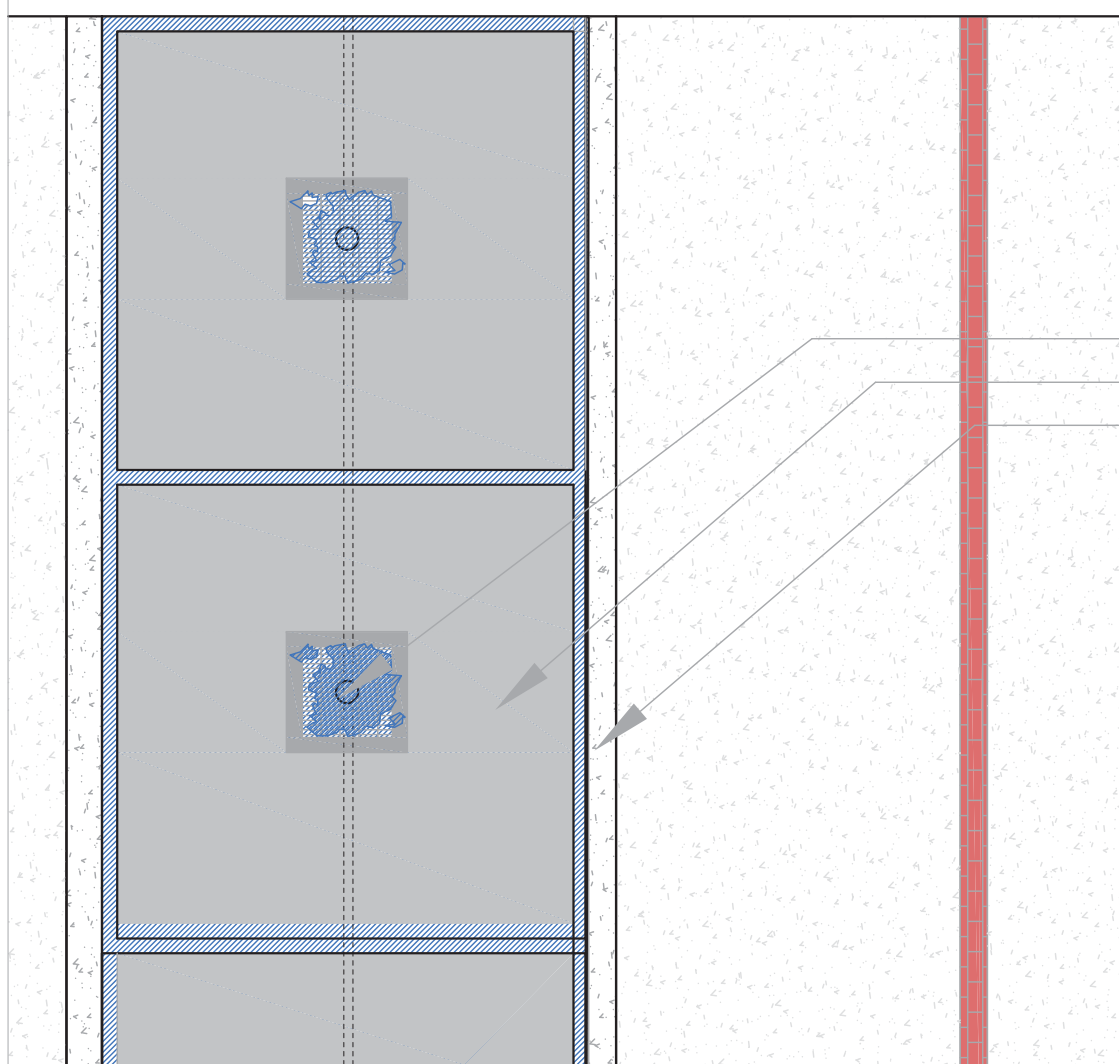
Typical section of erratic fountain. (Author, 2008) Scale 1: 25
